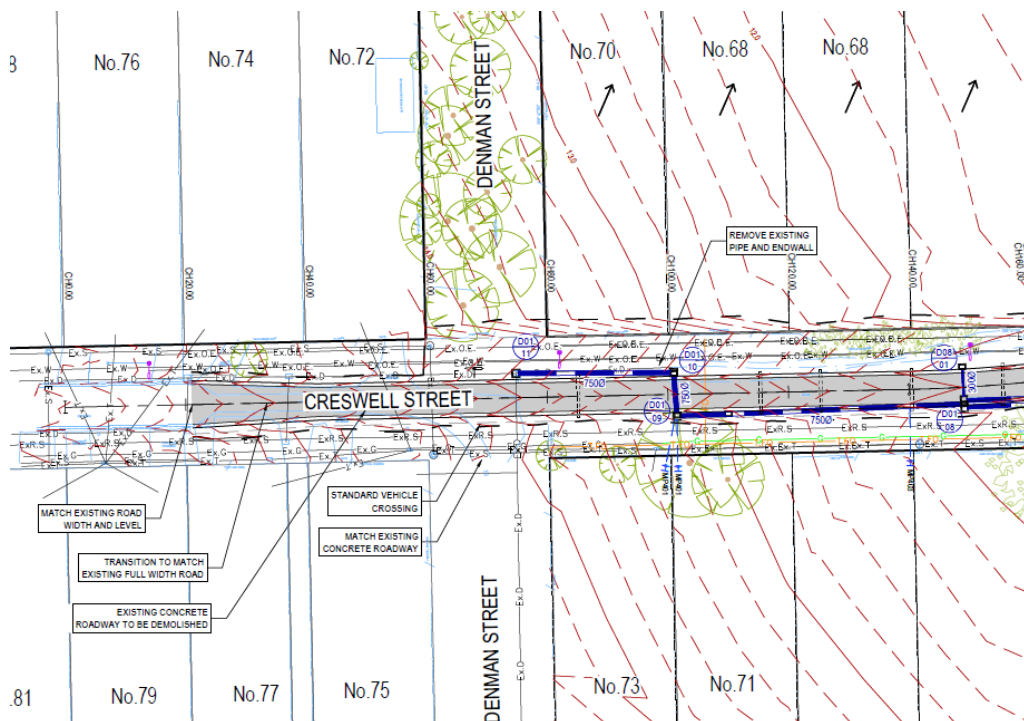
Western addition to Creswell Street works as per the 'Day 1' (or exhibited) version of the DCP
